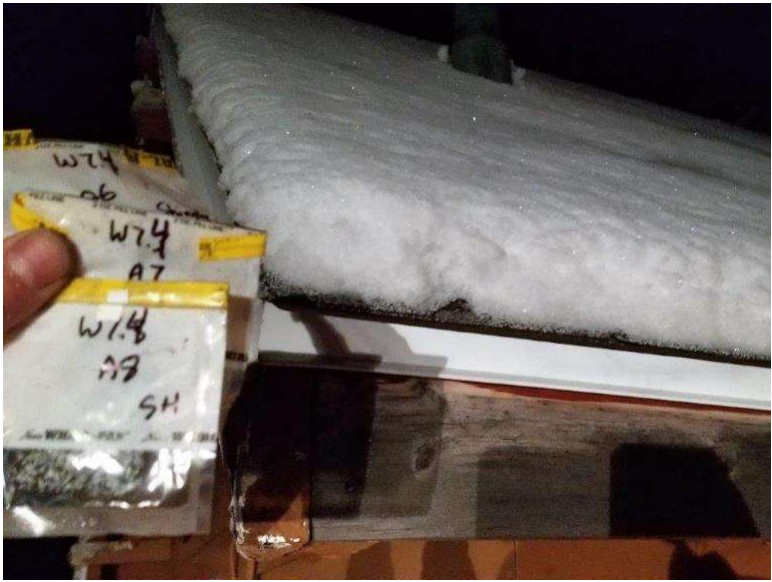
Site 7.4 Waterton Townsite Campground Washroom #9 Asbestos Sample A1, Chrysotile, 15%.
